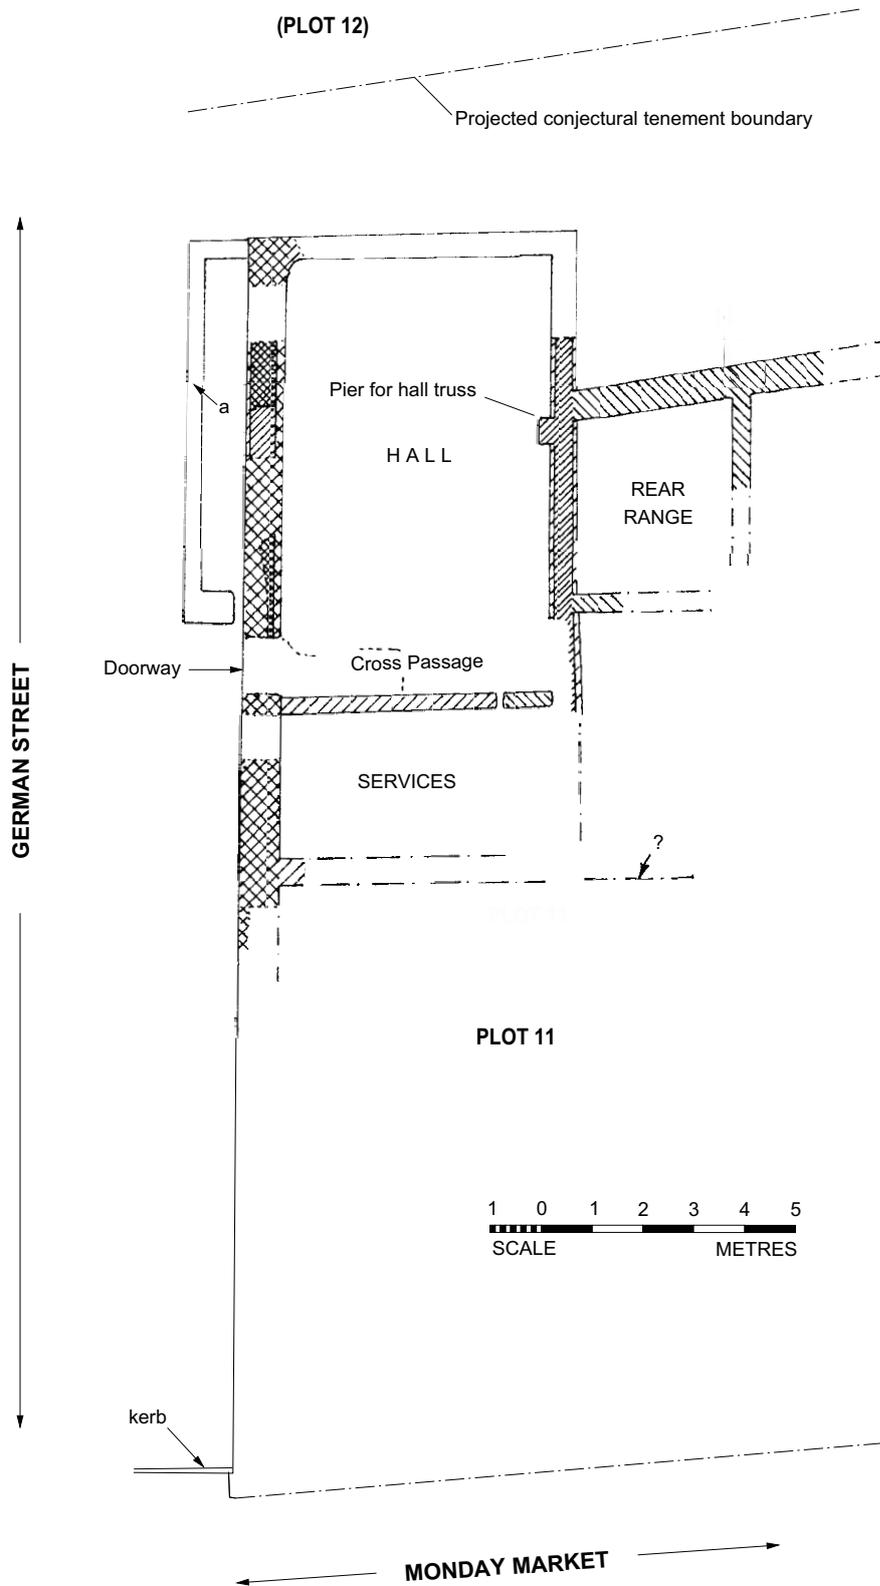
German Street, 1974. Plan of the phase-IIa building
